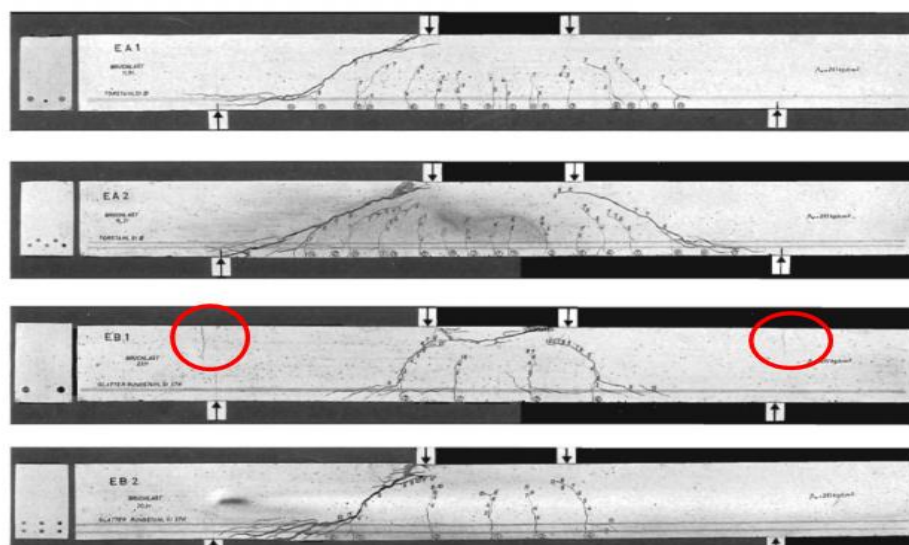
Crack patterns for beams reinforced with plain and ribbed bars (Y. Yang et al., 2016)
